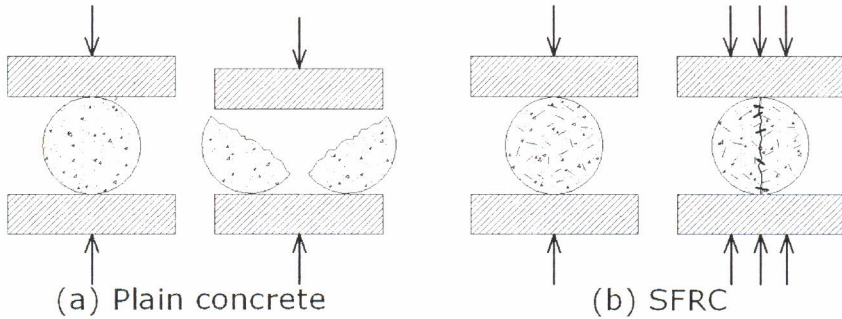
Mechanism under tension (a) brittle failure of plain concrete (b) crack bridging of SFRC
